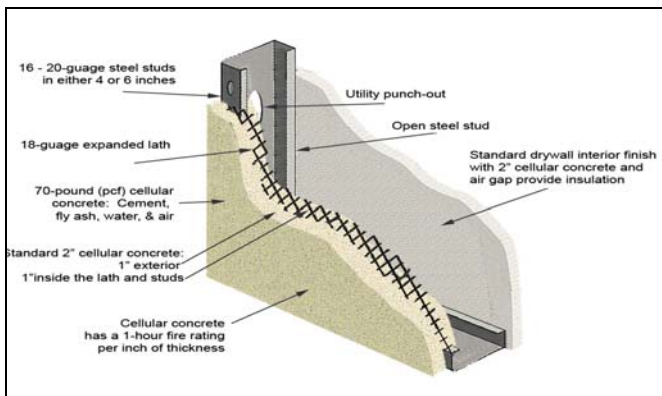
Typical LGS wall section where a combination of CLC and dry wall are used
